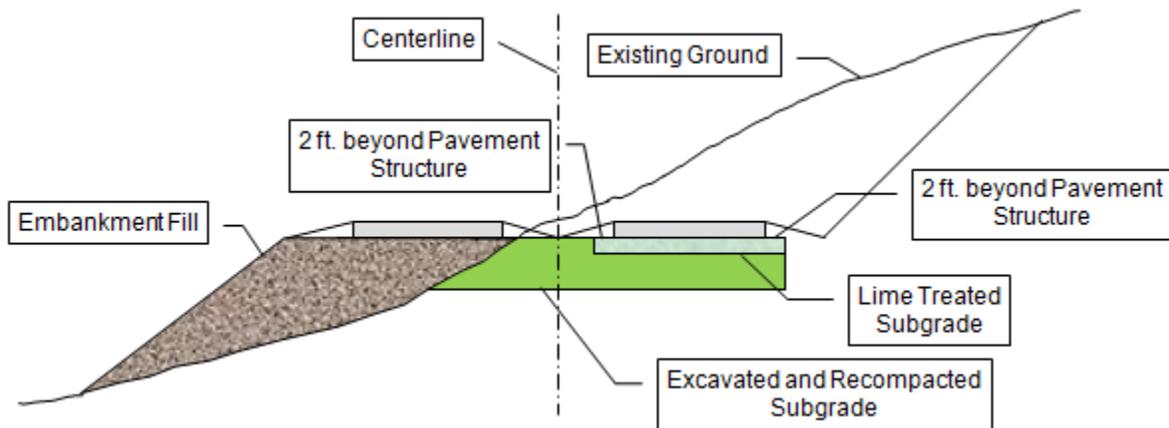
Cross Section of Lime Treated Cut Section Subgrade
